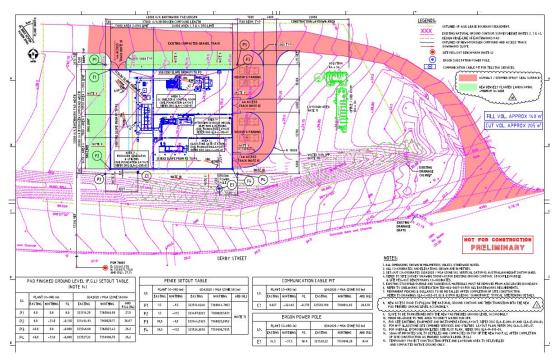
Proposed earthworks plan (including carparking, fencing and landscaping)
